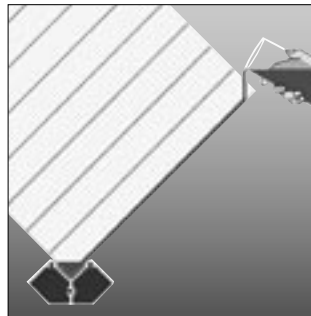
When casting the corner section the plate connection is sealed again.
